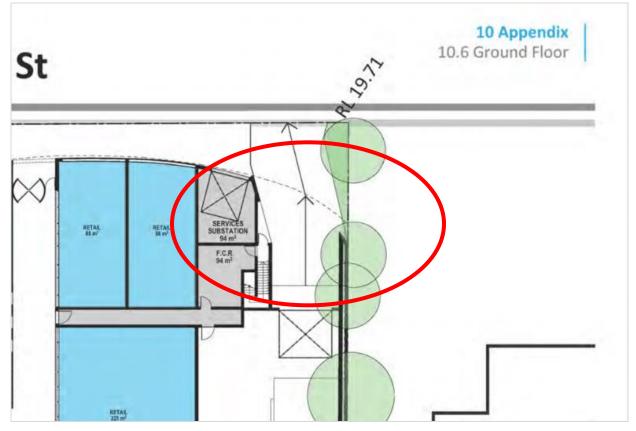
Extract of ground floor plan showing chamfered north eastern corner of podium (Source: Urban Link)
